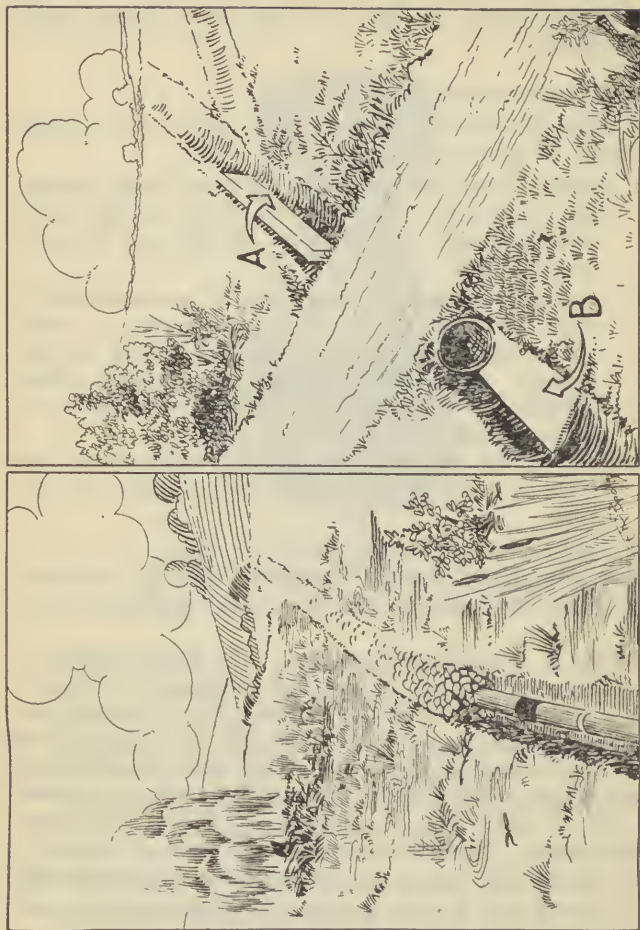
Drainage ditches used in mosquito control. Left, tile ditch back-filled with rock. Right, open ditch; A, B, protection of bank and floor with concrete.
